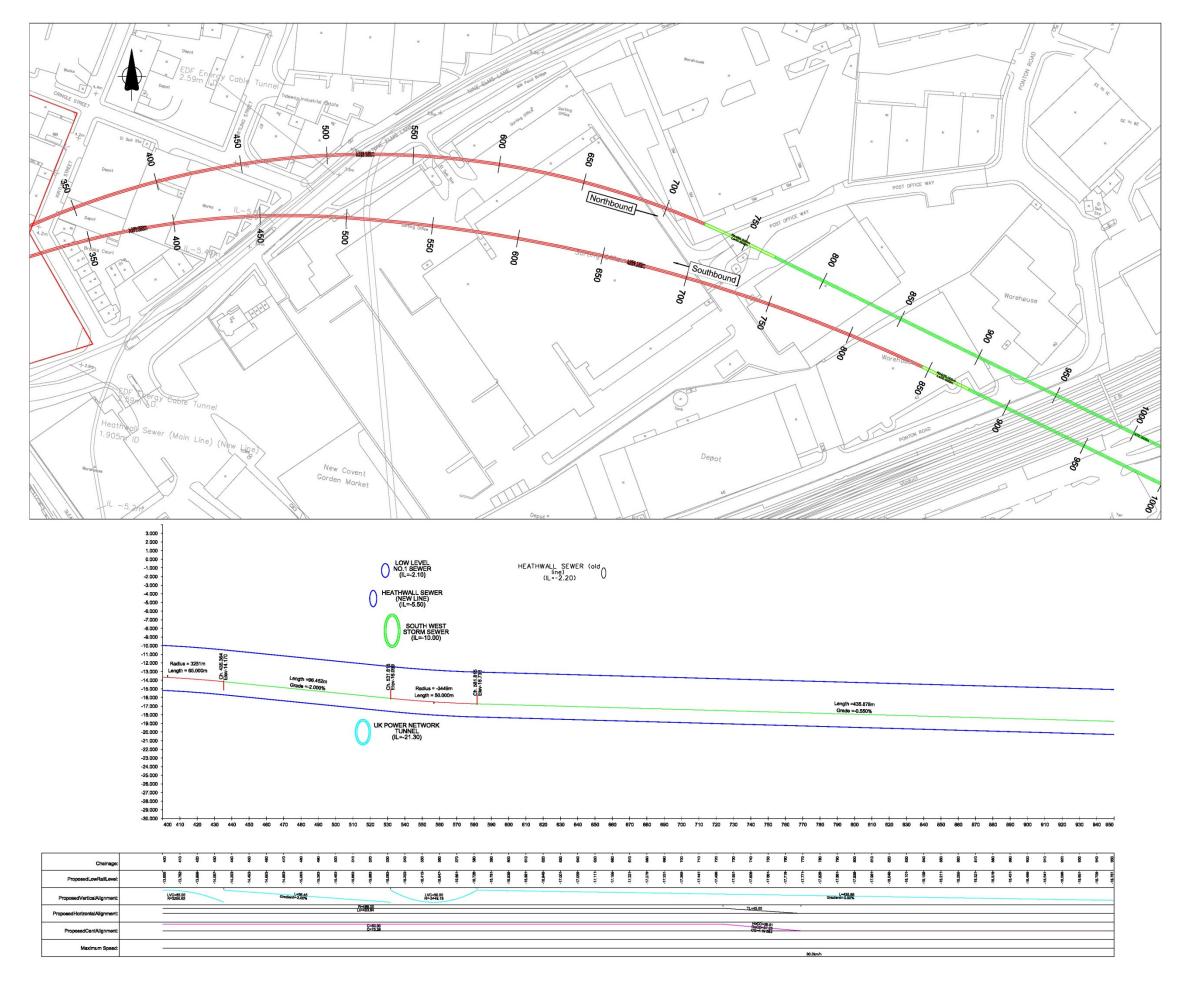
Northbound Horizontal and Vertical Track Alignment Sheet 2
